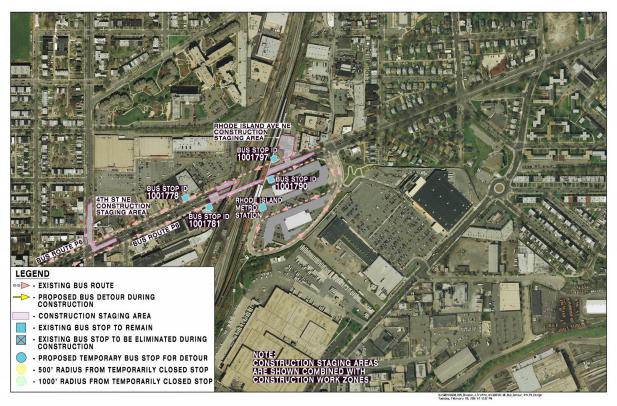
Study Area 2 - Existing Route D8 and Bus Stop Locations (Rhode Island Avenue Site)
